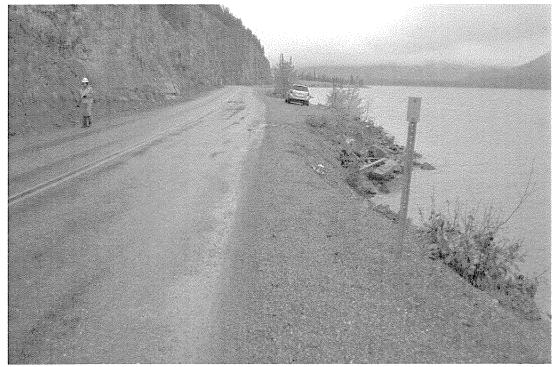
Looking South at Highway Shoulder above Existing Gabions between Stn. 701+628 and Stn. 701+646.
